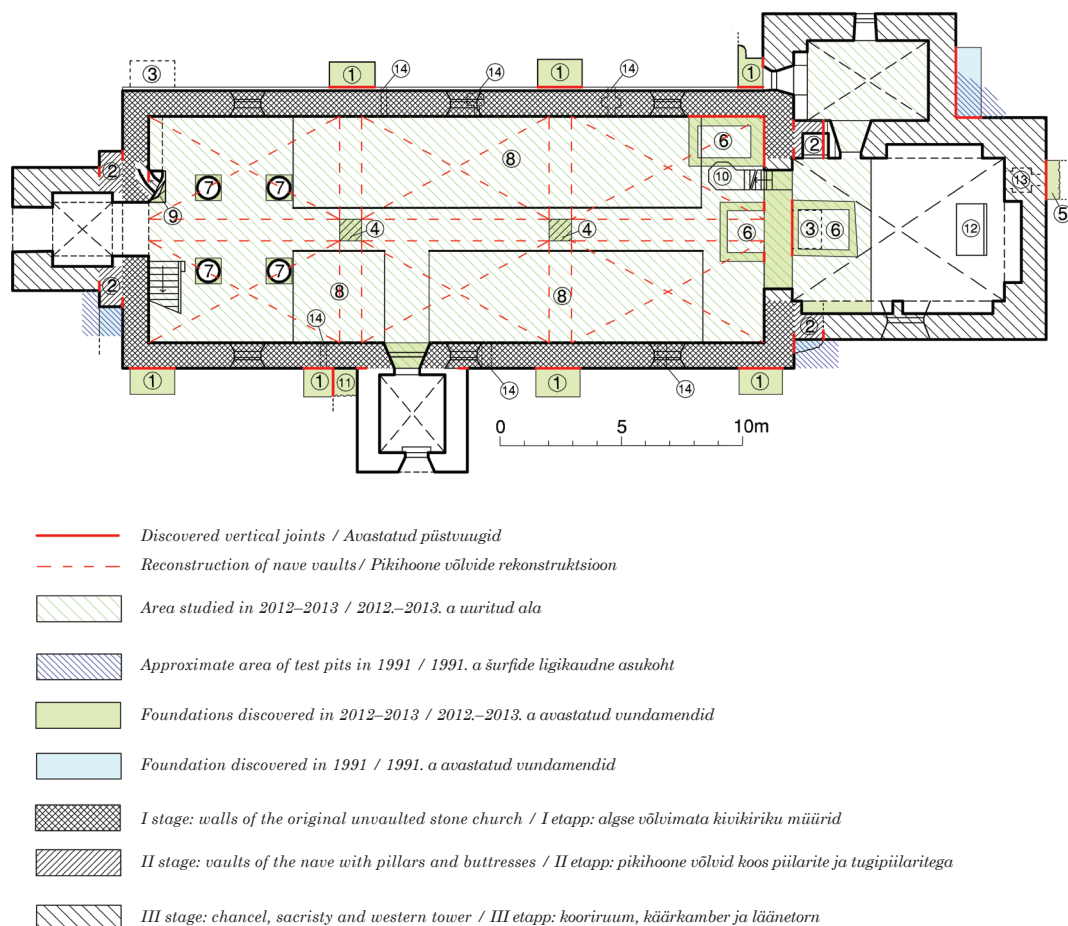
Plan of Lügänu church. 1 – foundations of buttresses, 2 – preserved buttresses, 3 – supposed buttresses, 4 – pillar foundations, 5 – foundation of stairs to the hagioscope, 6 – burial chambers, 7 – pillars of the organ balcony, 8 – pew areas, 9 – stairs to the tower, 10 – pulpit, 11 – older foundation west of the porch, 12 – altar, 13 – hagioscope, 14 – ventilation openings.
